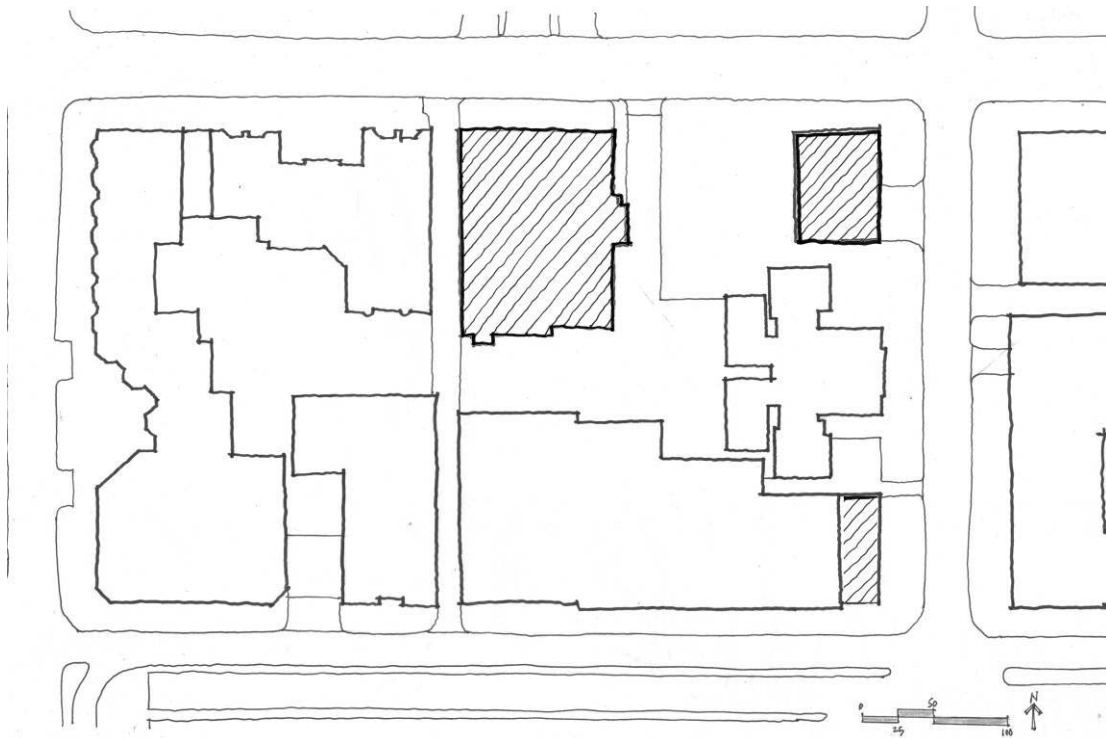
Site showing buildings to be demolished. Buildings that are hatched will be removed.
